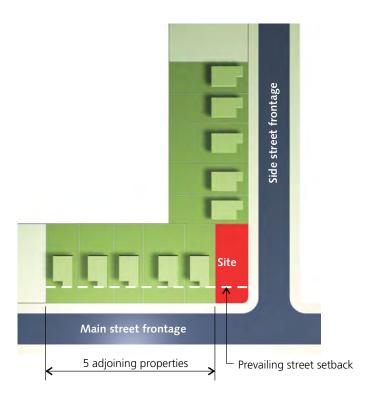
Calculation of the prevailing street setback on a corner development site
